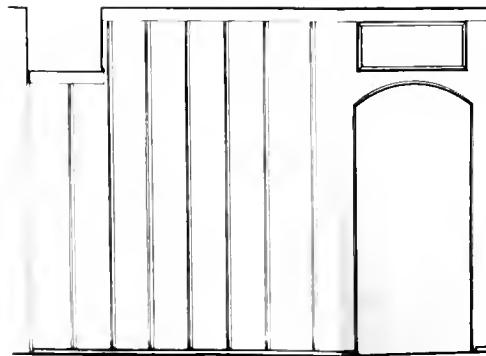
East Hall, North Elevation This wall, like the other three is of several elevations. The left side is where the lavatory and is feather board across until the arched opening which leads into the small space where the lavatory door and door to the rear terrace exist.
